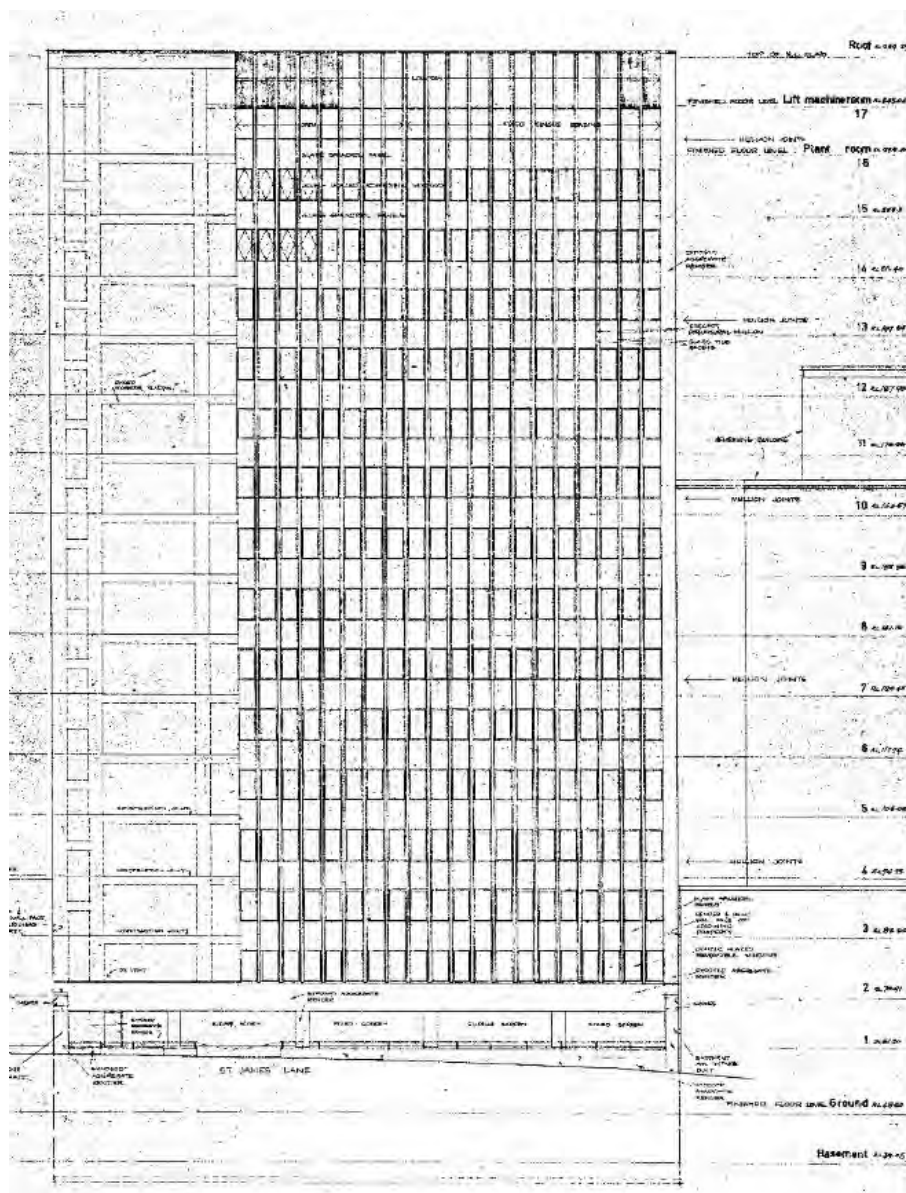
The north elevation; with a higher ground level at St James Lane (BAP).
